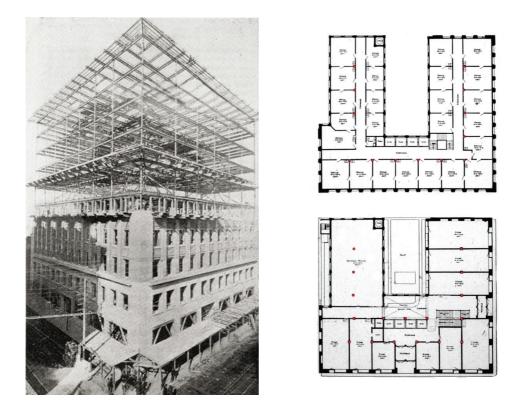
The Wainwright Building, St. Louis, Missouri, USA, 1890-91. Architects: Dankmar Adler, Louis Sullivan. Red dots: the internal steel-frame structure.
